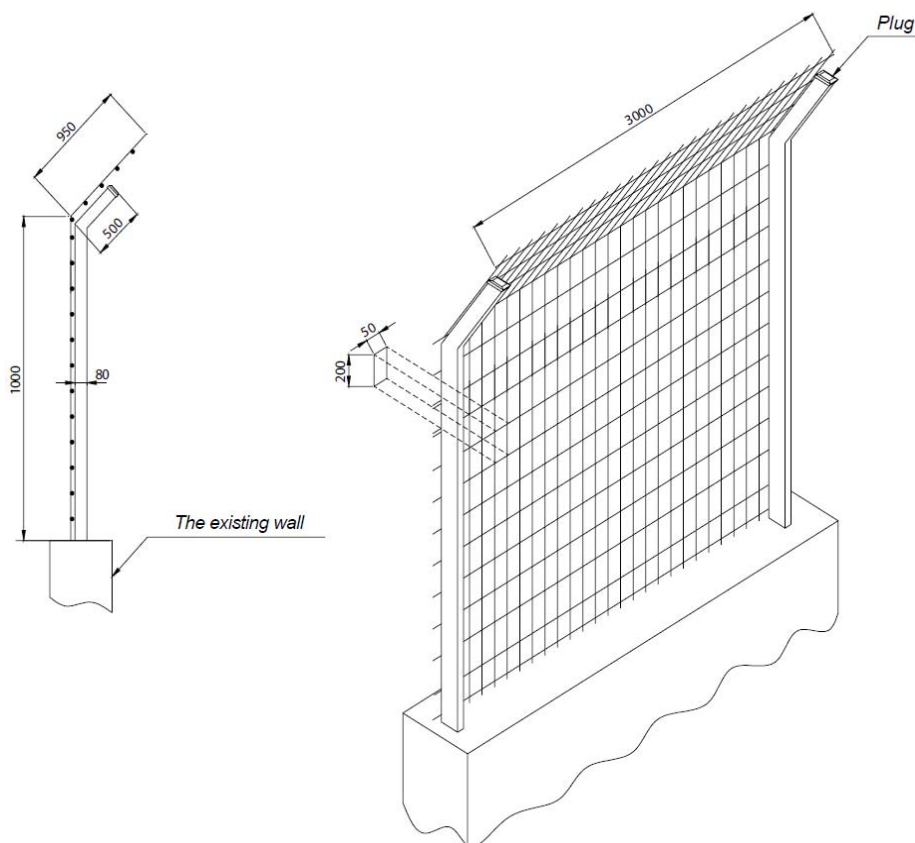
Welded wire mesh extension for mounting on top of the existing wall
